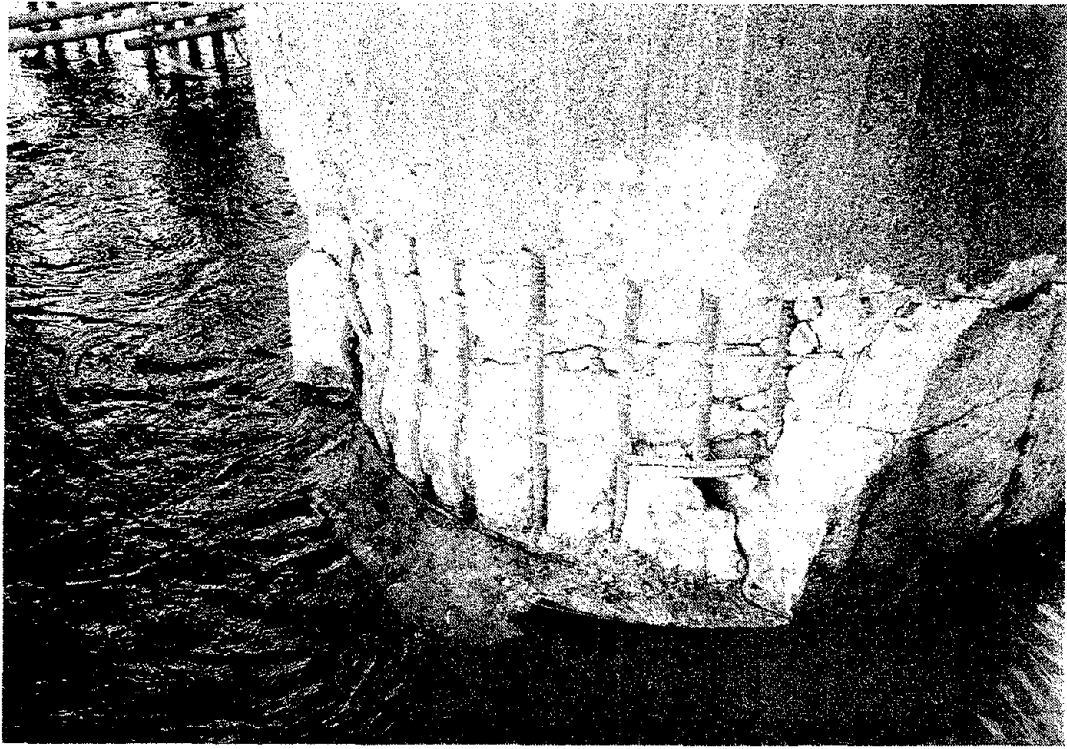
Damage of Pier P3 (from the upper stream side)
